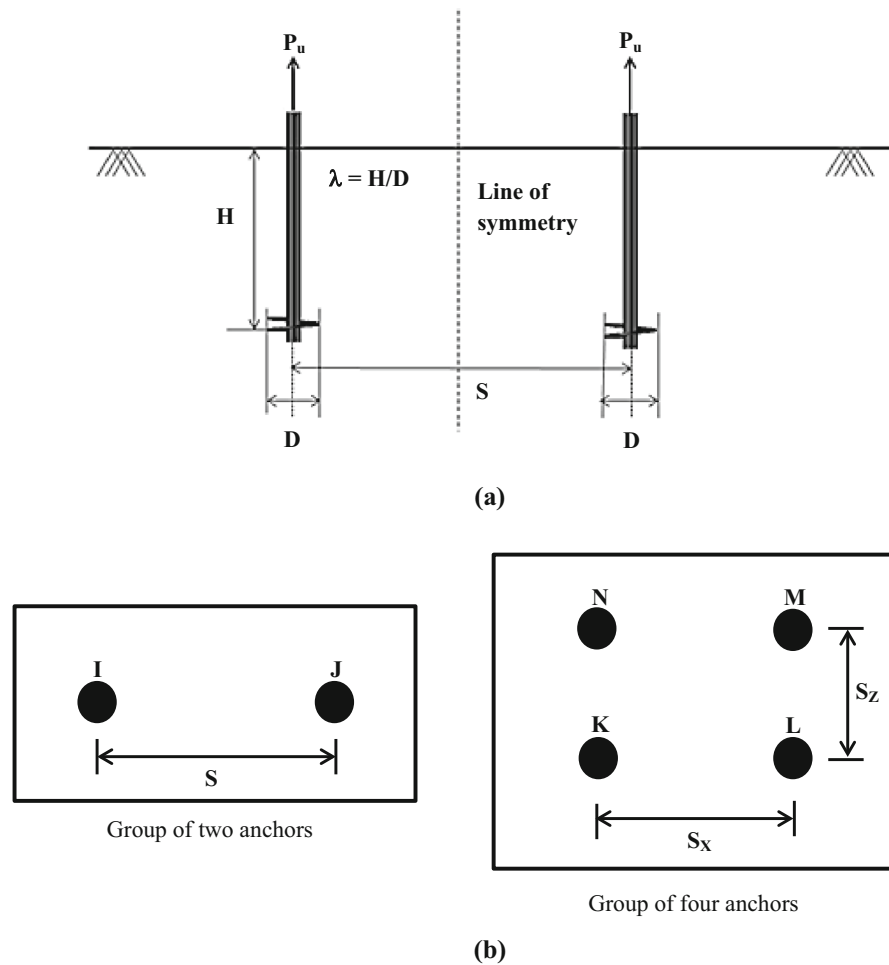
Configuration of interacting helical anchors a cross-sectional view, b plan view
